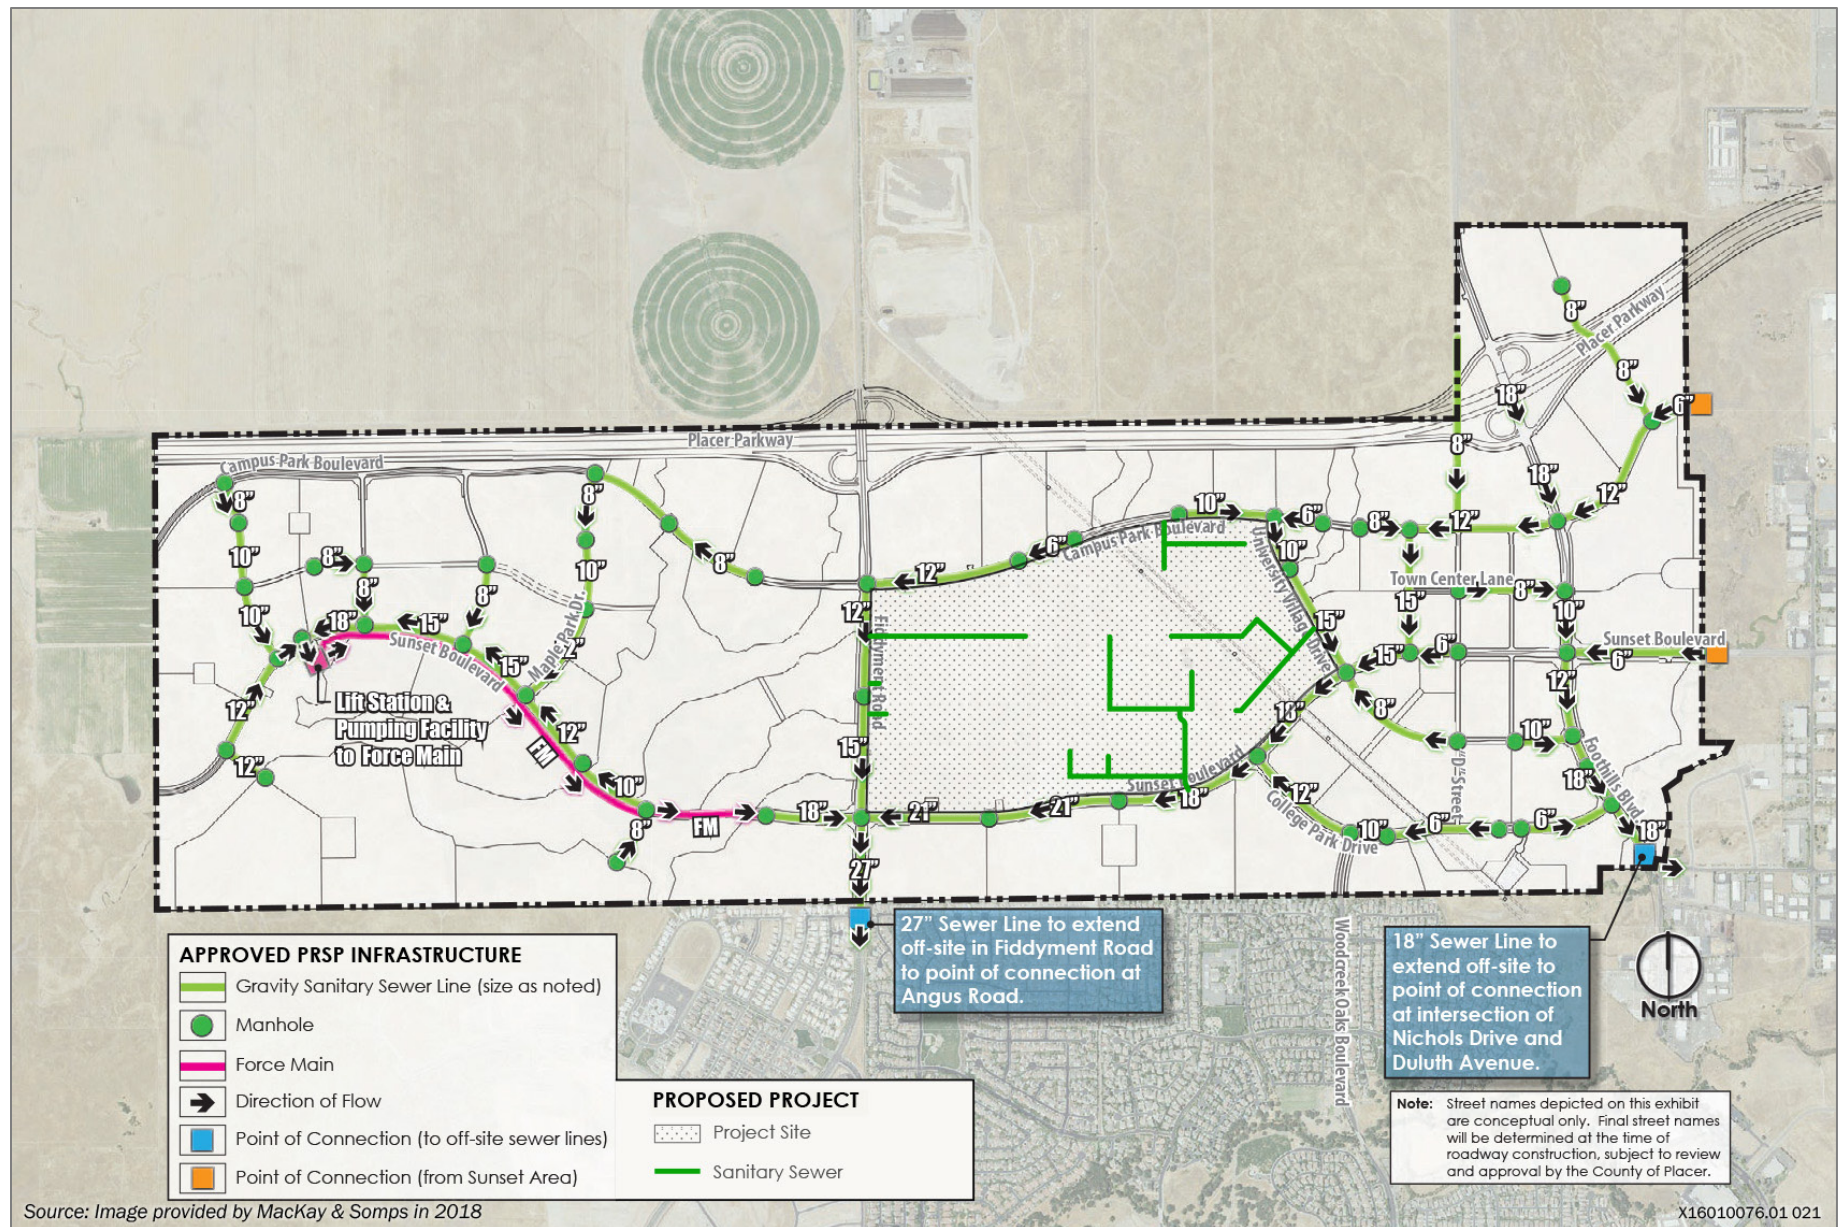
Placer Ranch Specific Plan and Sacramento State – Placer Center Wastewater Infrastructure
